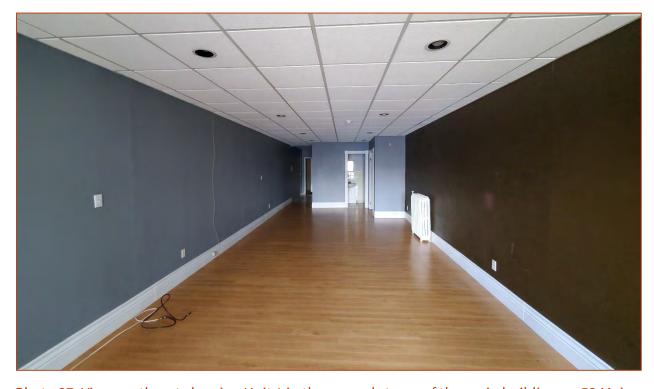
View northeast showing Unit 1 in the second storey of the main building on 52 Main Street North
